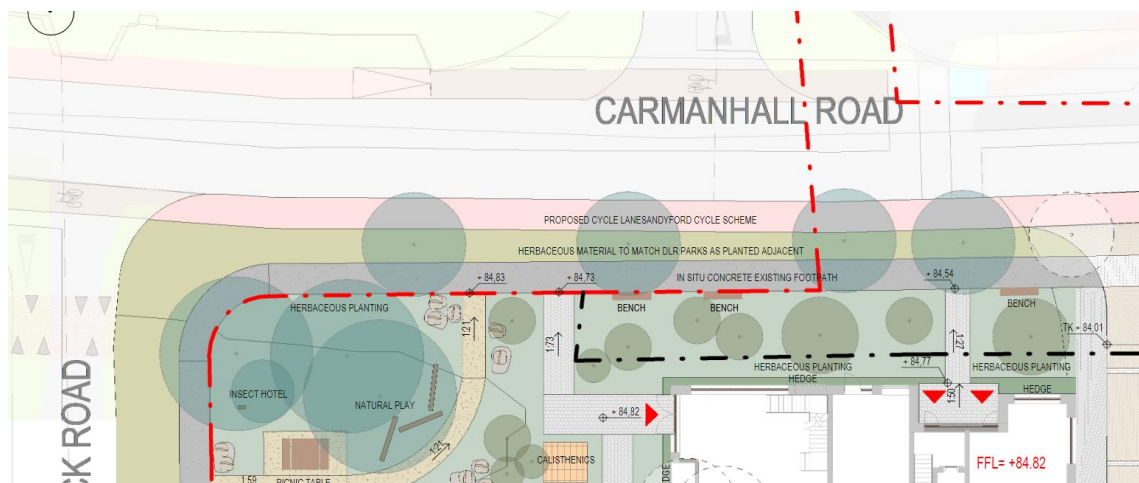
Extract from Landscape layout drawing by NMP Landscape Architects
